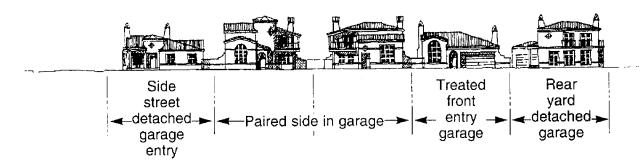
Typical Housing Elevation (example of Mediterranean style)
